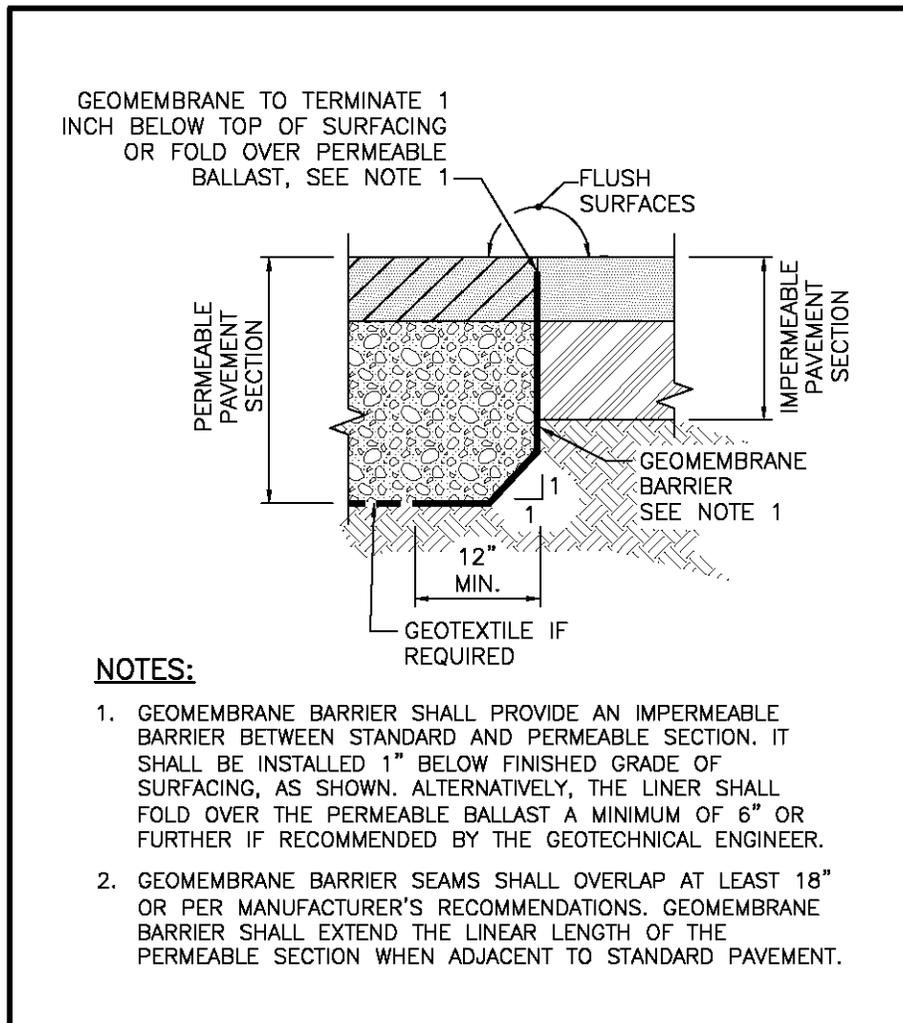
Permeable Pavement Concrete Edge Treatment.
